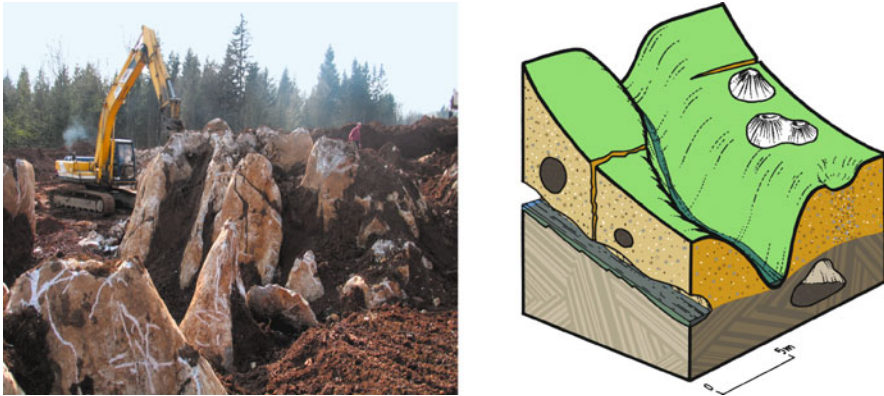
Subsoil stone forest excavation (*left*) and caves in breccia above flysch (*right*)
